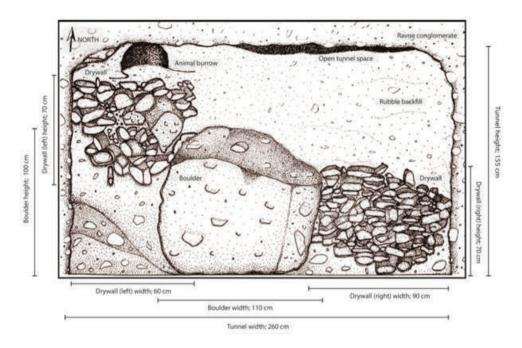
Drywall (drywall 3) discovered in the Ravne 3 tunnels (drawing made by R. Hoyle, 2020)
